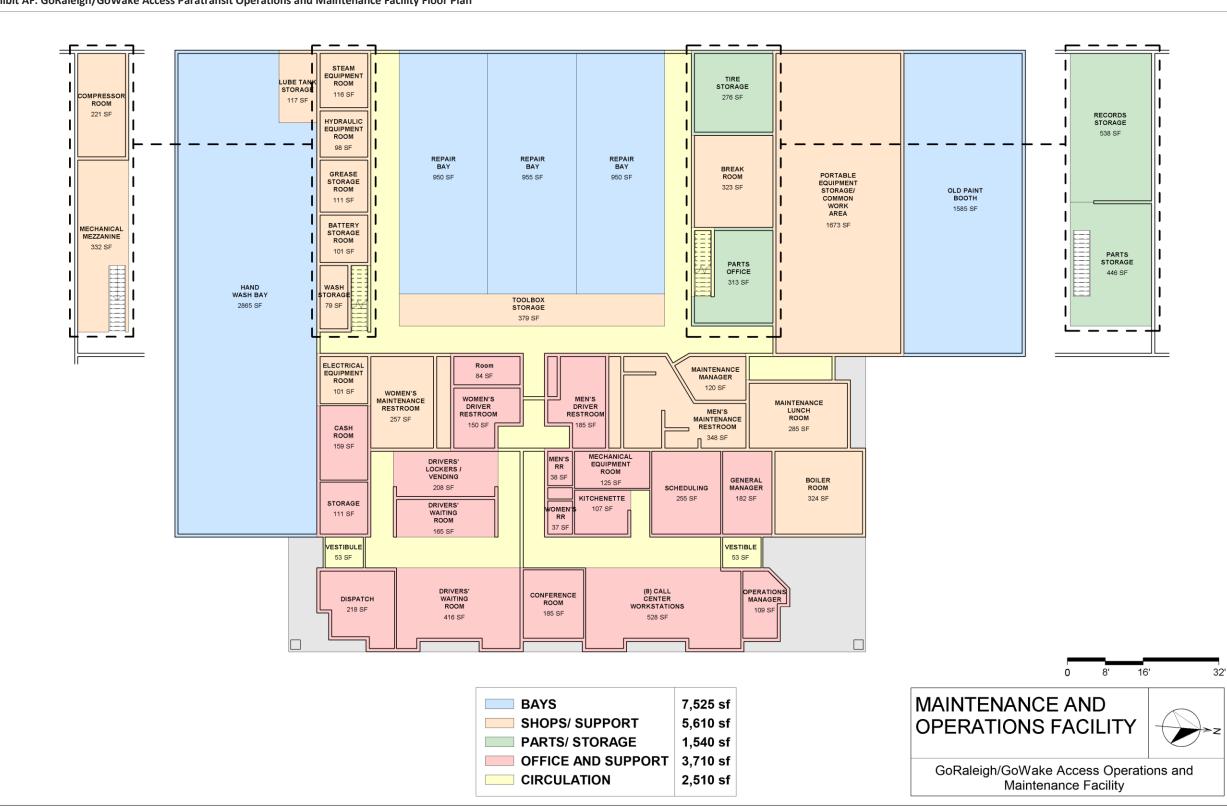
#### Exhibit AF: GoRaleigh/GoWake Access Paratransit Operations and Maintenance Facility Floor Plan
